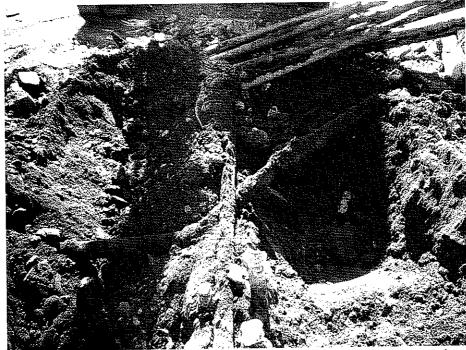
Fifth Street Test Pit. Note the pipe crossing over the excavation.
